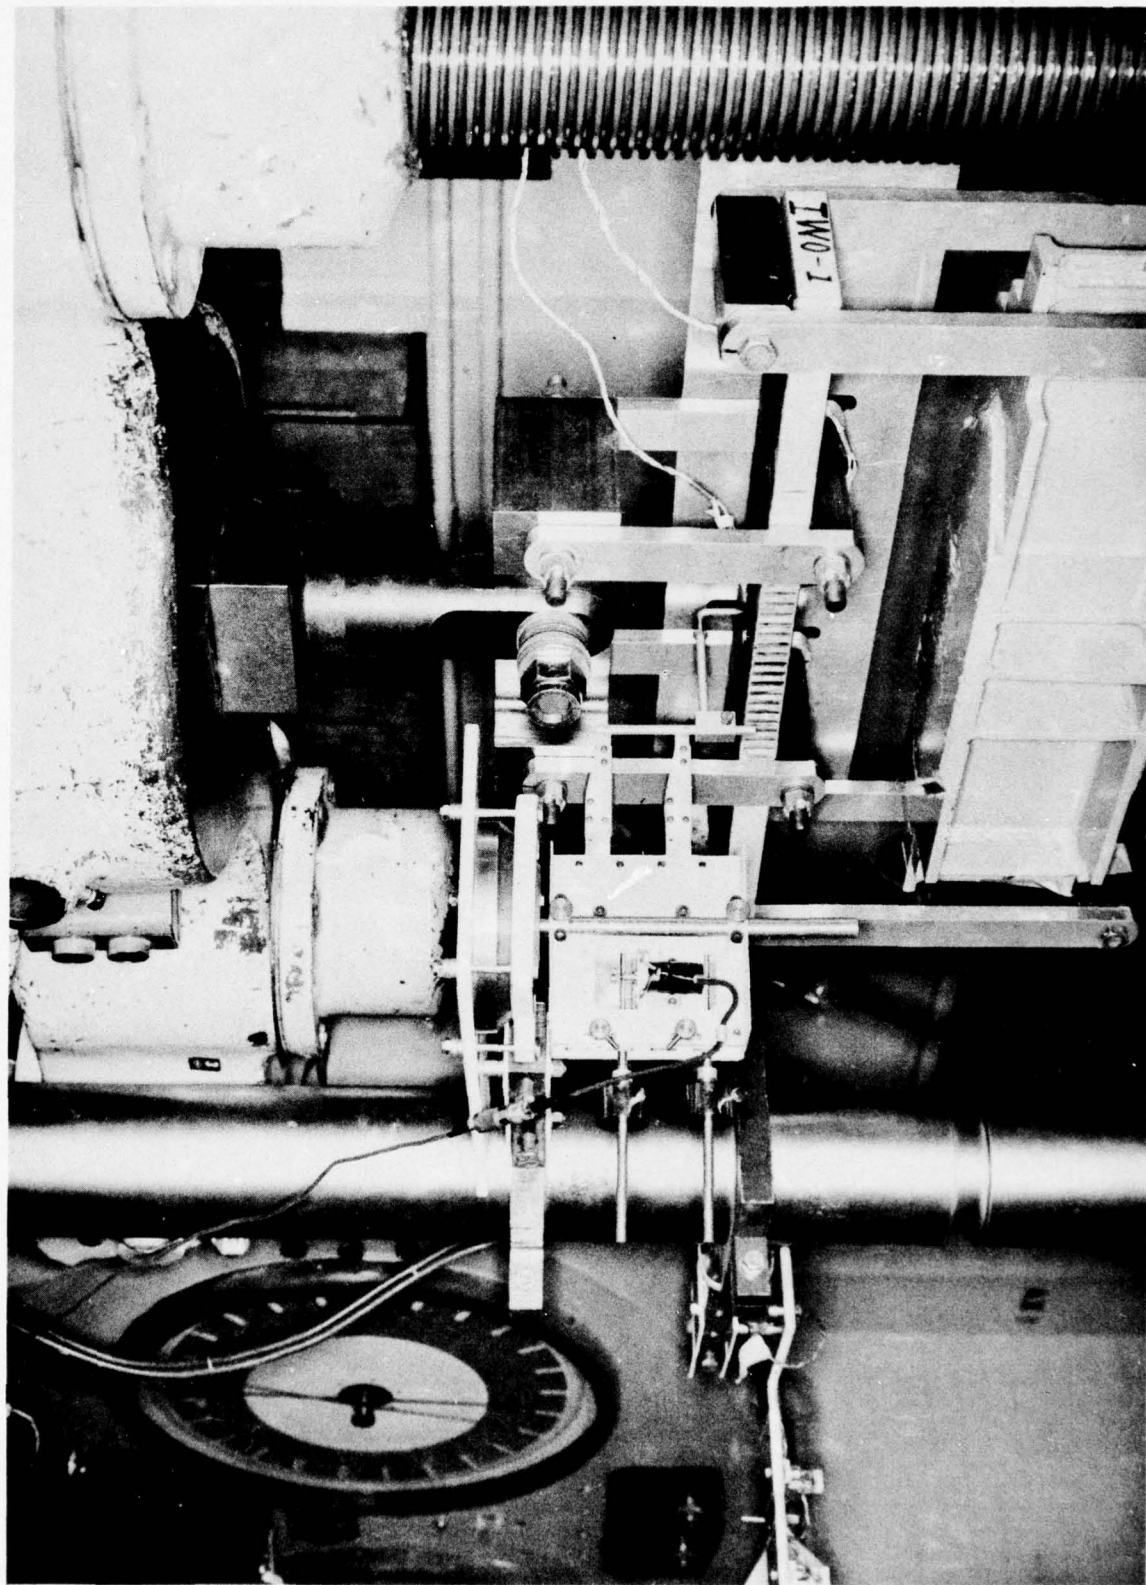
TEST SET-UP FOR FLEXURAL BEAM SPECIMENS (TR-141)
